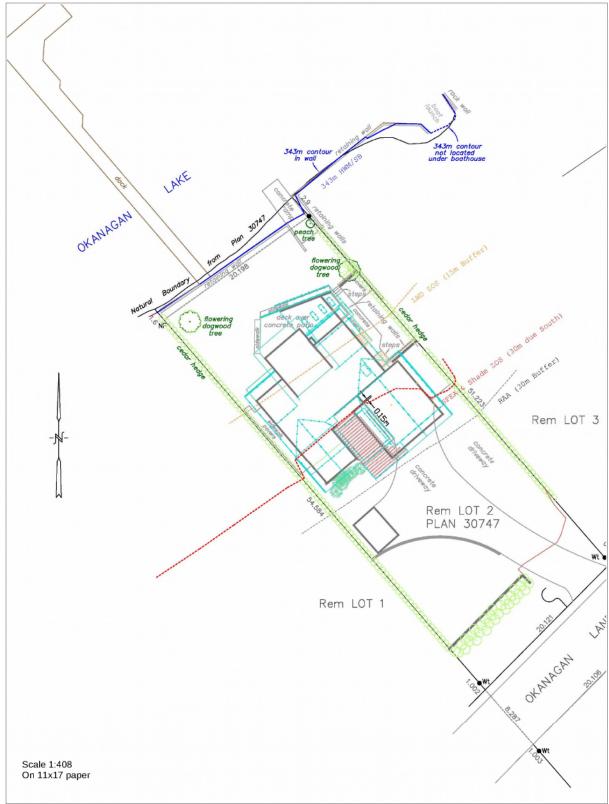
Site plan with proposed re-development structures (grey), proposed roof-line (light blue), existing trees and hedge and RAPR determined SPEA (red dashed) – Aerial Image removed for clarity.
